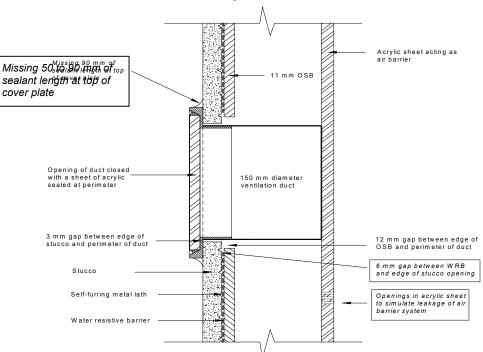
Duct detail for specimens No. 1 to No. 4 – vertical section
